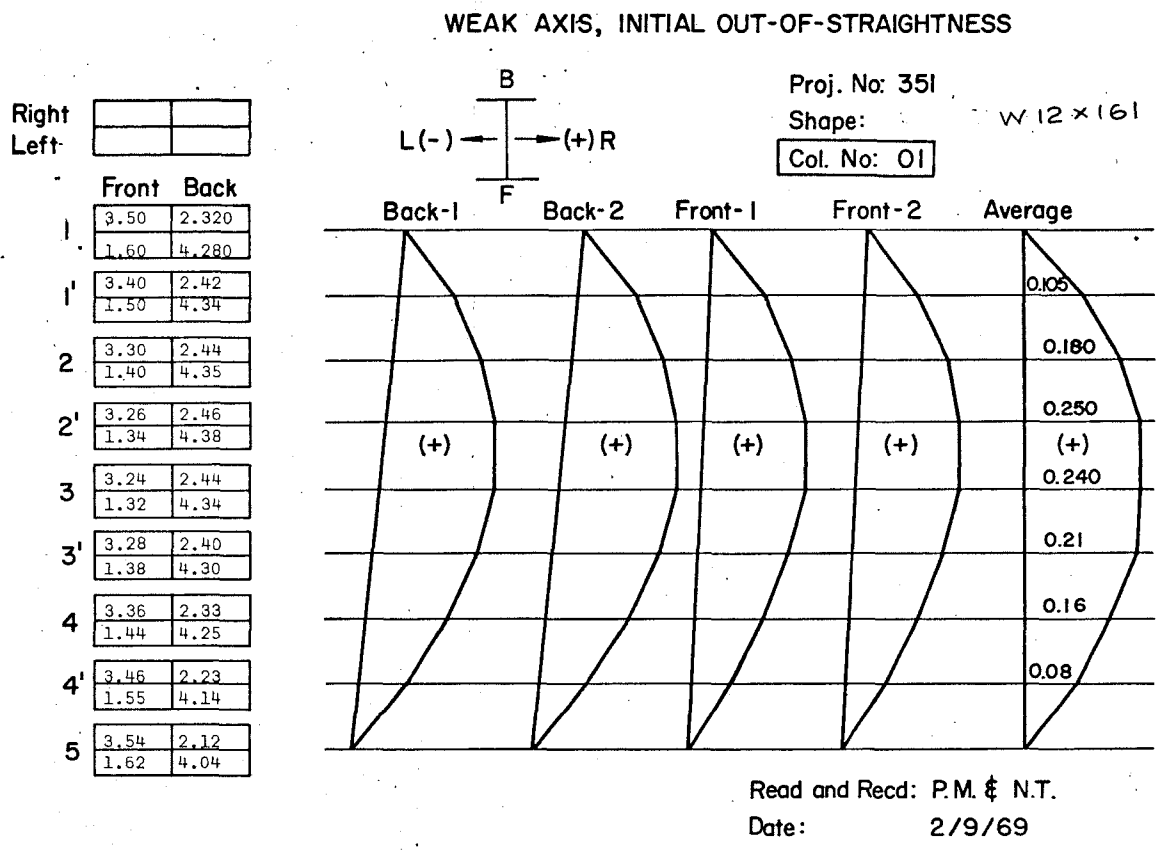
Measurement of Initial Out-of-Straightness (Weak Axis) (Dimensions in inches)
